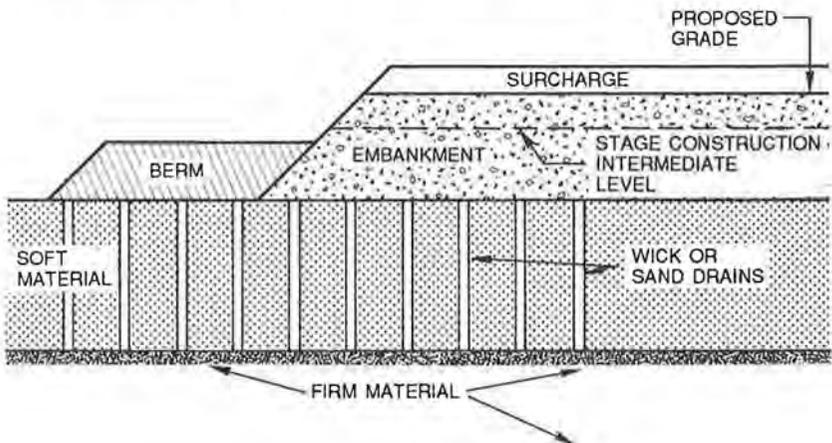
Stabilization by consolidation with a surcharge fill and wick or sand drains (courtesy New York State Department of Transportation).
